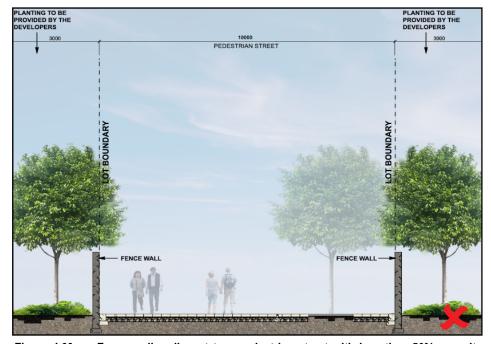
Fence walls adjacent to a pedestrian street with less than 50% porosity should be avoided
